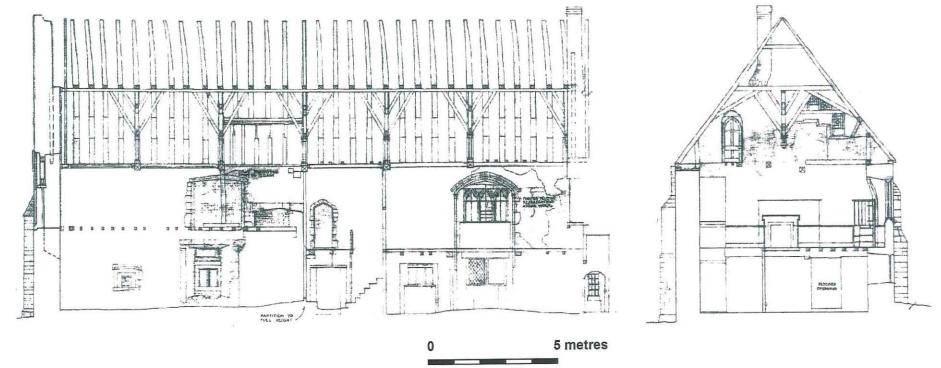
Longitudinal section looking north and cross-section looking east (Department of the Environment: Ancient Monuments Branch 1976)
